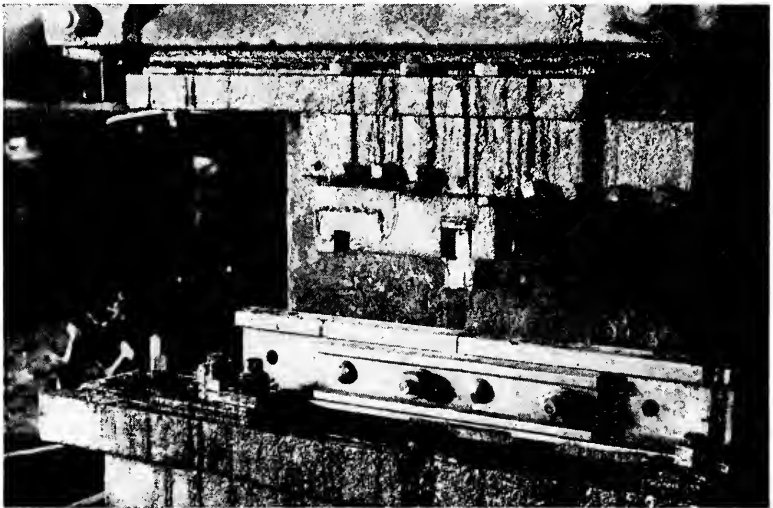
Assembled Joint in the Fatigue Testing Machine.
